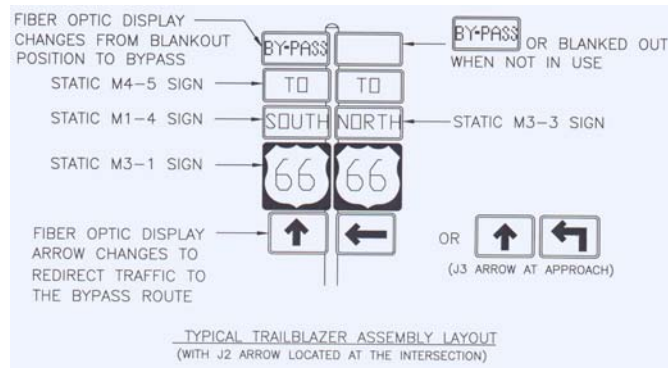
Dynamic Trailblazer Assembly Layout
